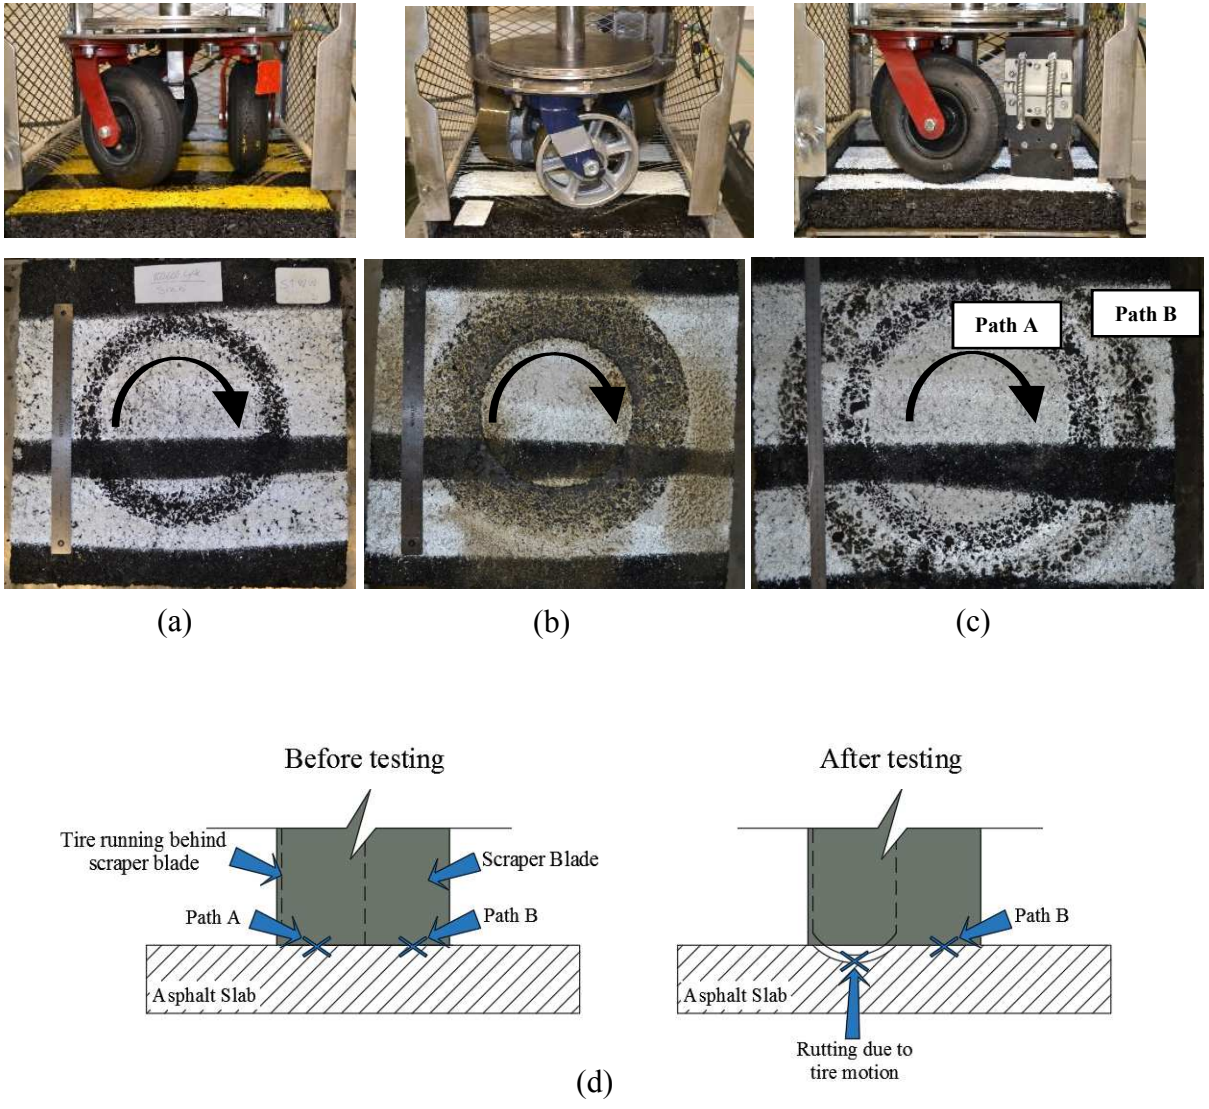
Waterborne markings polished imprints, (a) pneumatic wheelset, (b) steel wheelset, (c) combination of the pneumatic wheels and the scraper blade, and (d) front view section showing the drawback due to overhanging of the scraper blade and tire on path A
